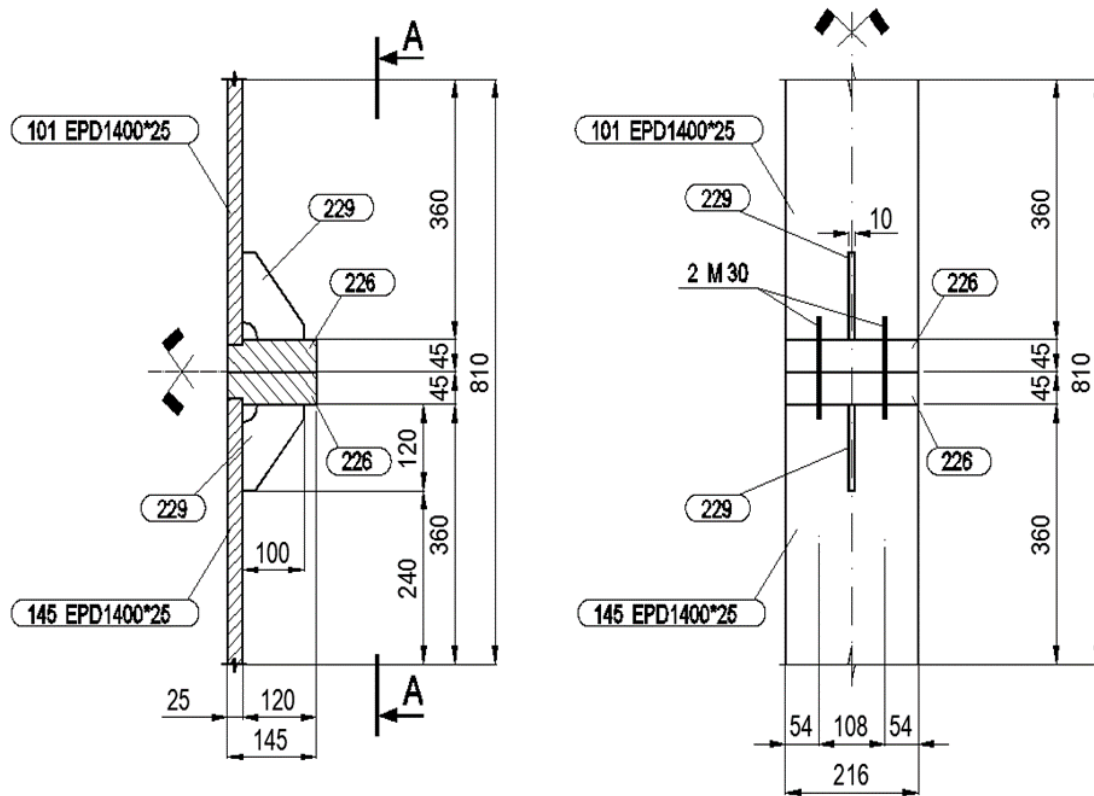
Details of symmetrical part of the bolted flange joint.
